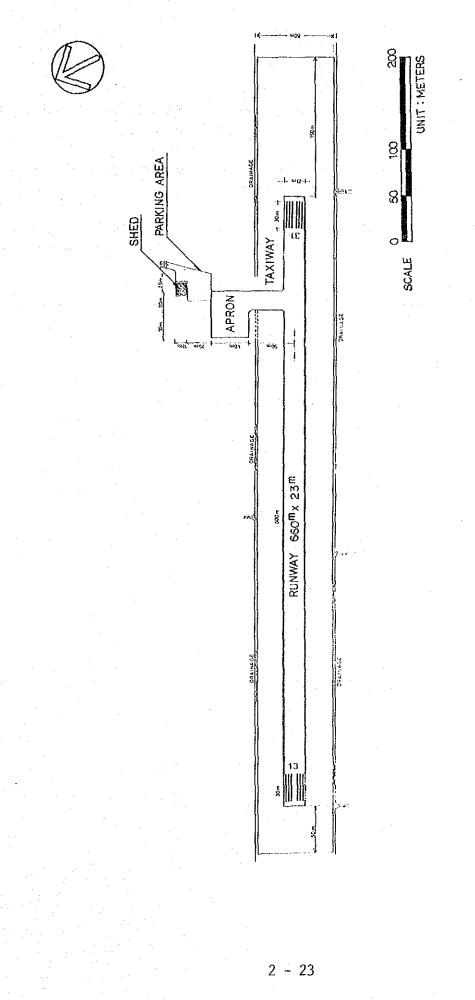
Existing Layout of Cilacap Airstrip
